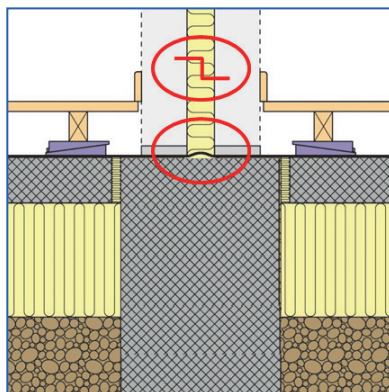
Typical errors such as insufficiently separated double walls with wall ties bridging the cavity wall or both leaves of the cavity wall located on the same foundation, compare with Figure 5.7.
